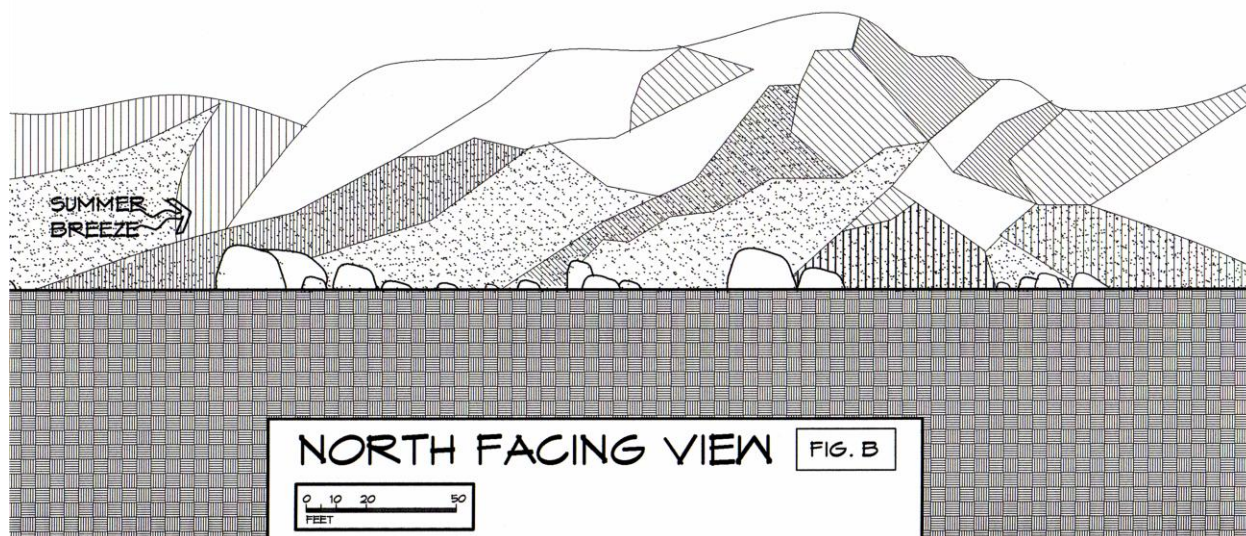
FIGURE B – USE THIS ELEVATION AS A BACKDROP FOR YOUR HOUSE. BY SHOWING A THE FAÇADE SUPERIMPOSED ON THIS VIEW. ATTACH TO PRESENTATION BOARD.
